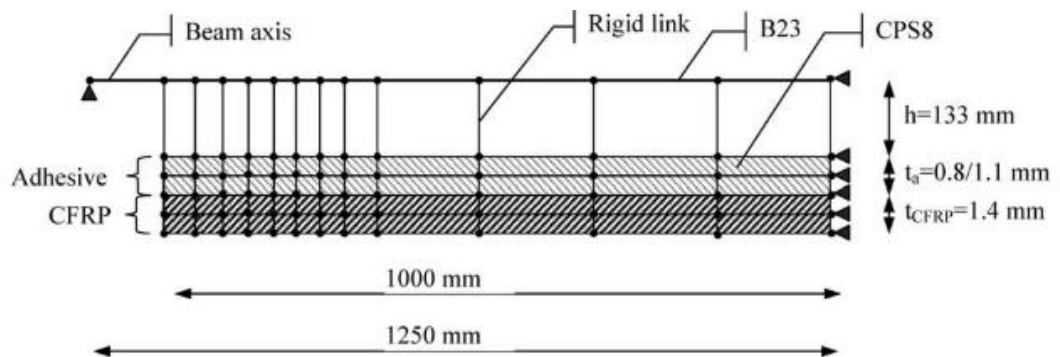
Modeling of the bonded reinforcement and necessary constraints to the steel beam (Source: Colombi and Poggi 2006)
